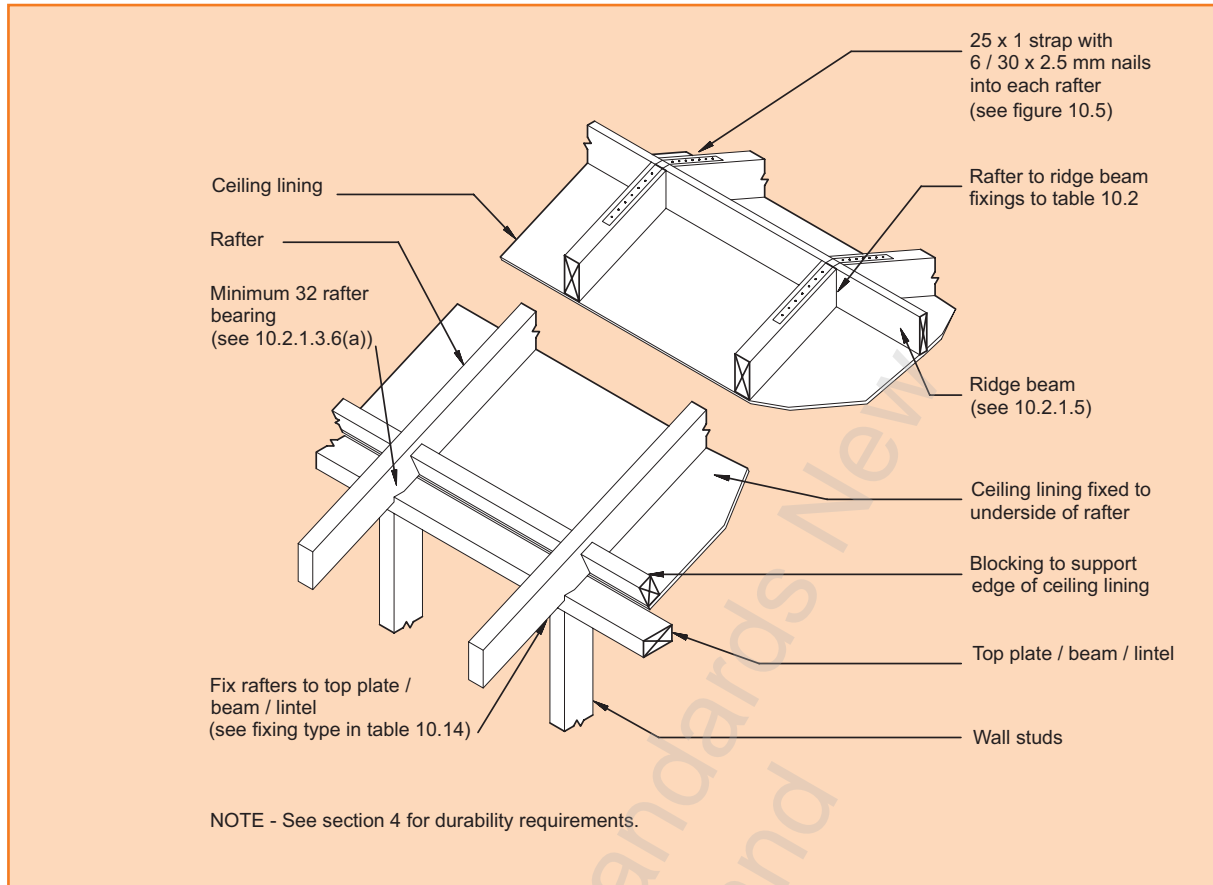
Fixing rafters – Skillion roof (see 10.2.1.3.7)
